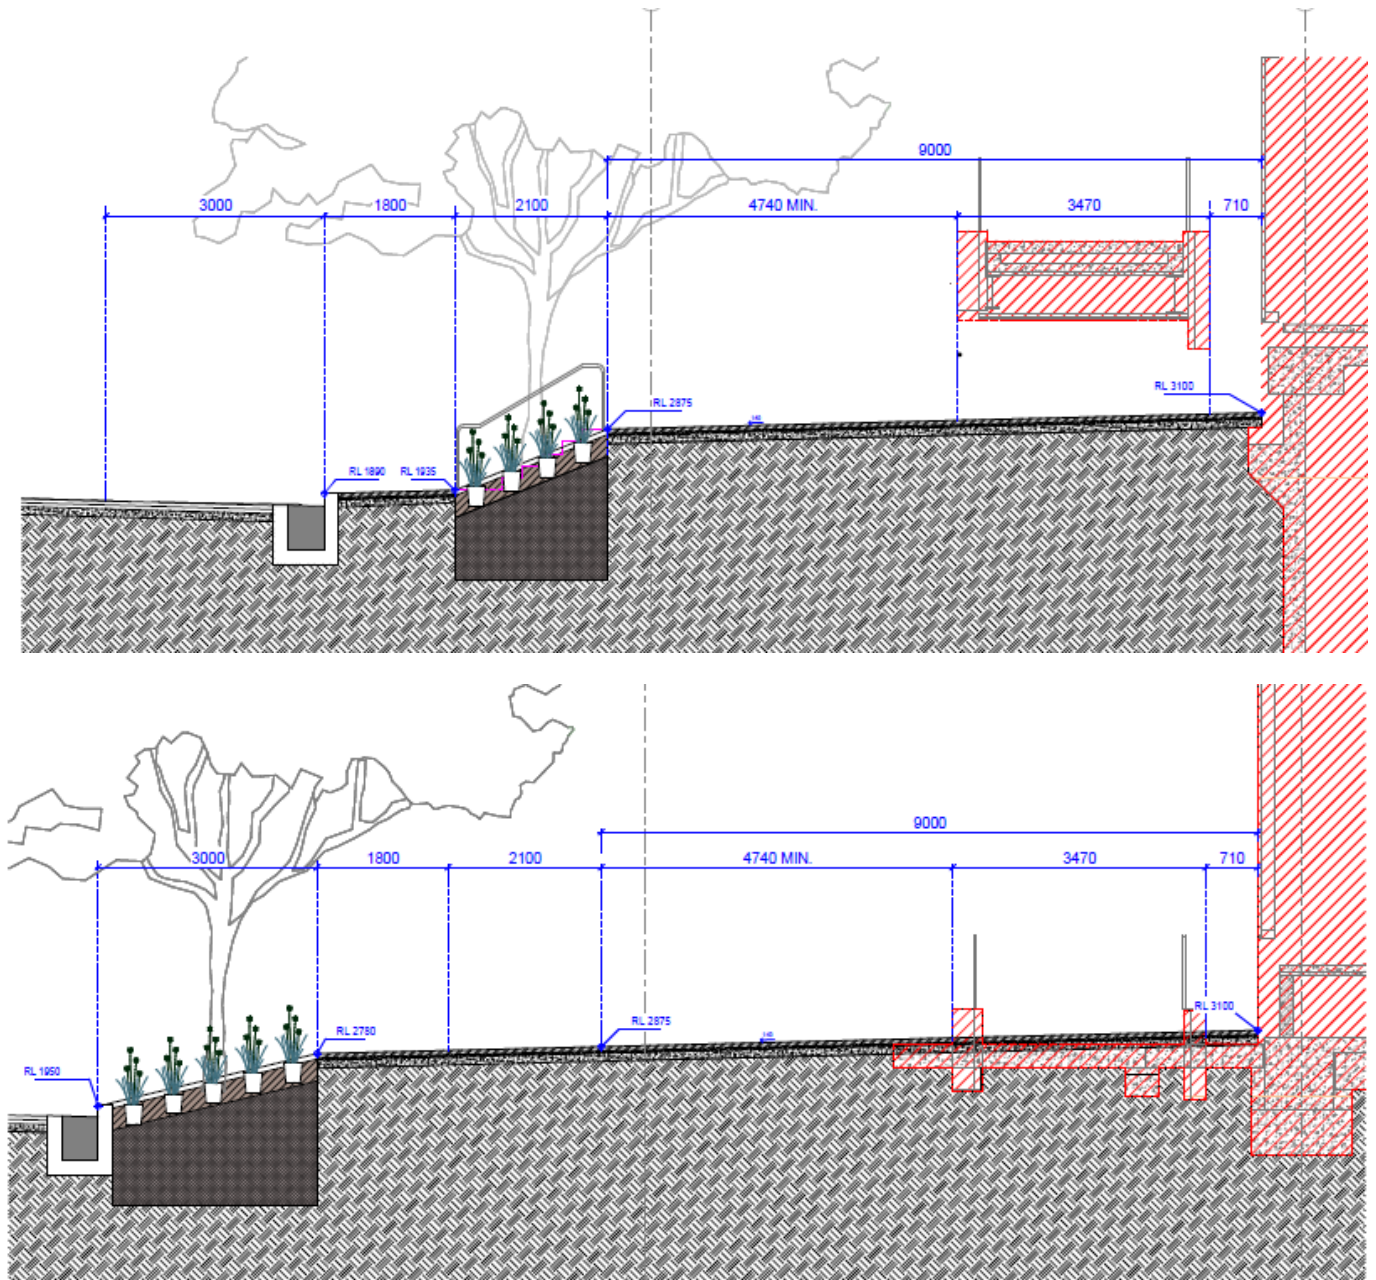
Illustrative section indicating landscaping zones between amended Bridge Road and building
